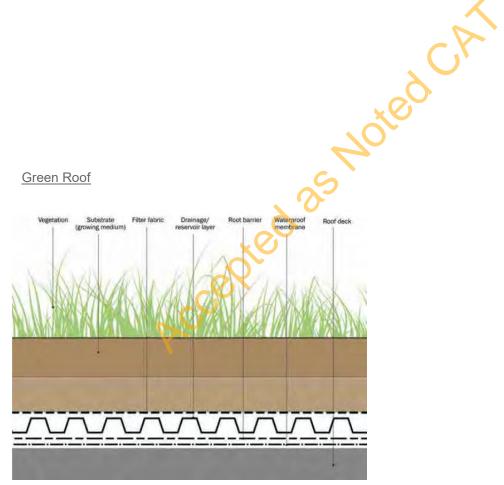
Section showing typical extensive green roof components (CIRIA C753 figure 12.1)
